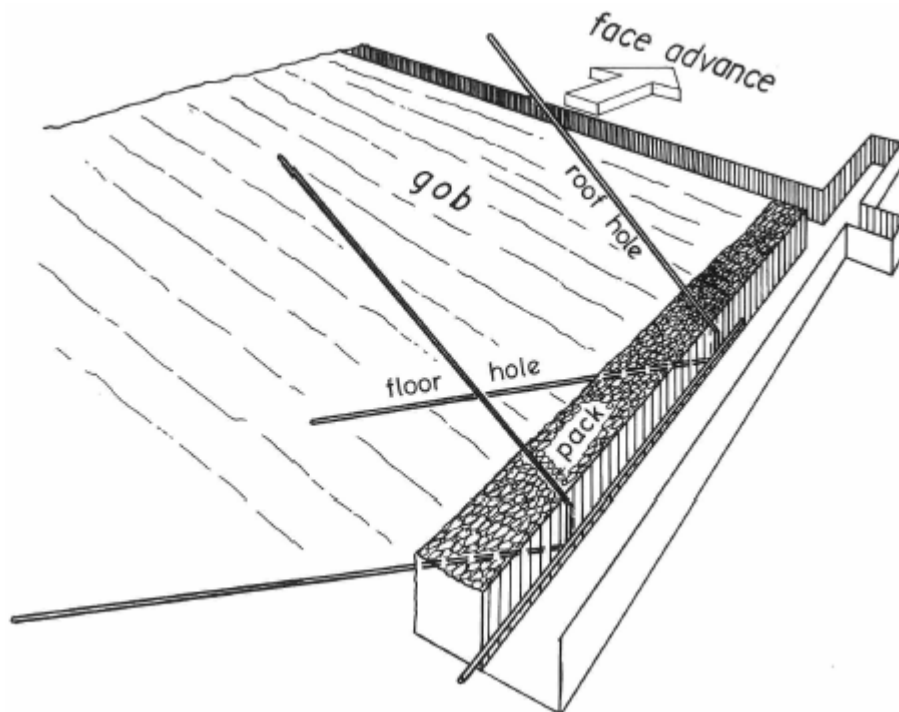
Cross-measures methane drainage in an advancing longwall panel.
